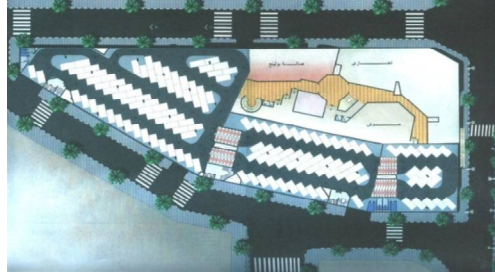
Basement floor plan (-1) of Underground Garage at El Darrasa.
